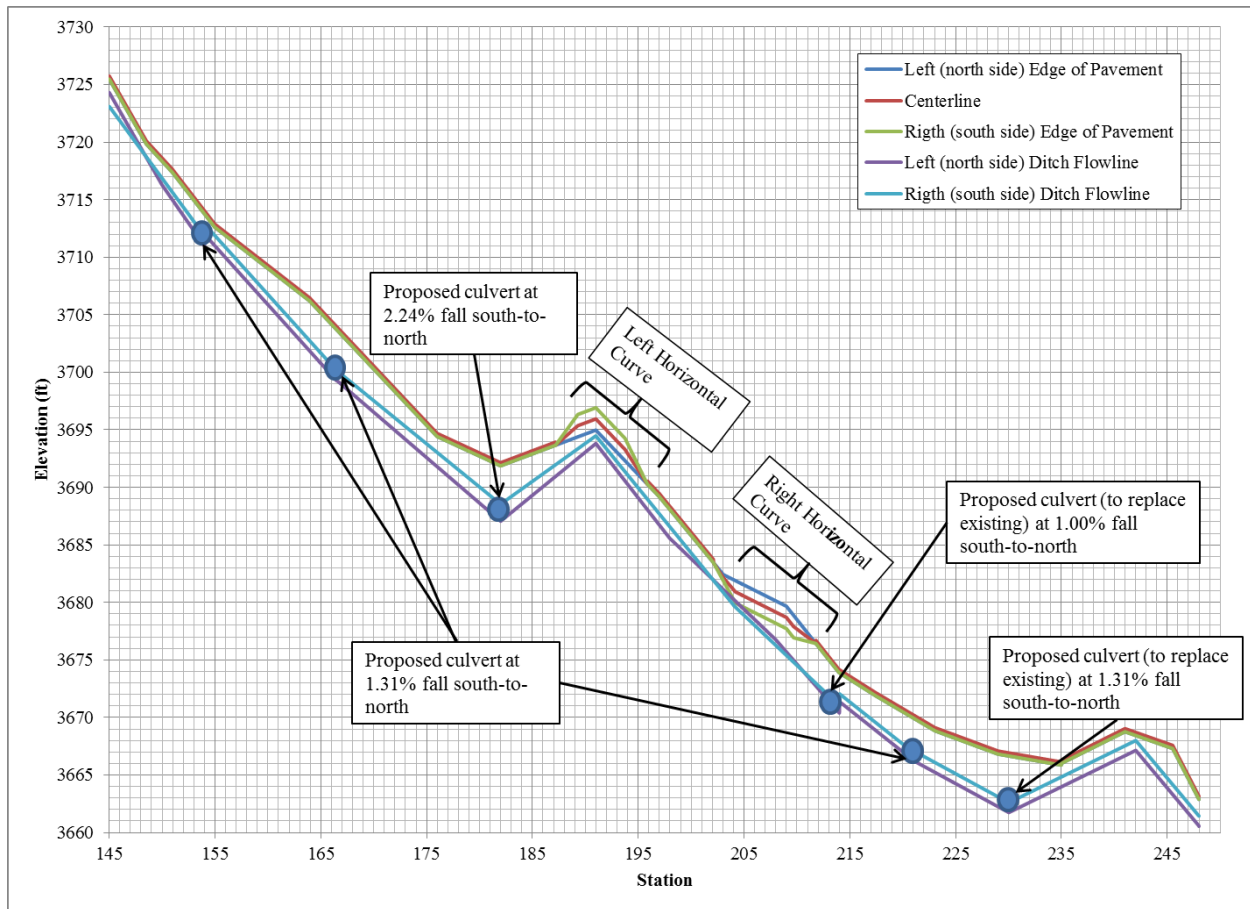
Design Profiles from STA 145+00 to STA 250+00.
